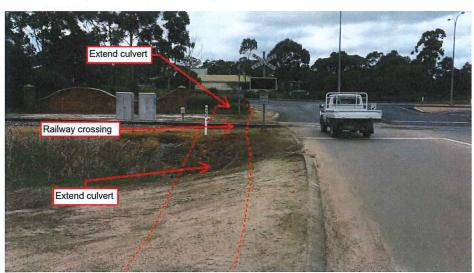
Culvert extensions and rail crossing on Mondurup Street at Albany Highway intersection
